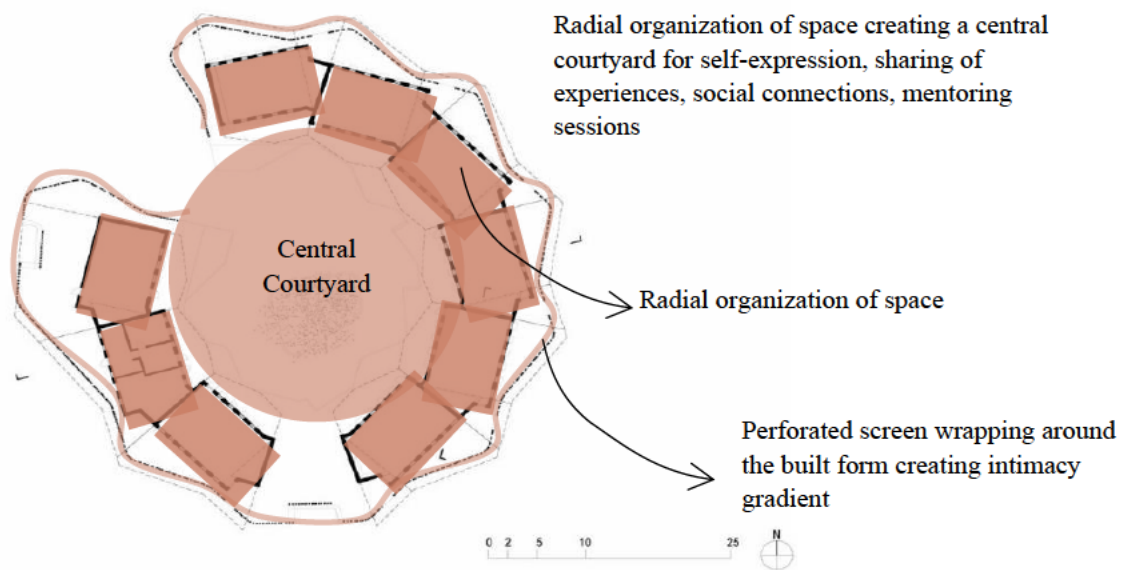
vi: The ground floor plan arrangement of spaces and form of spaces. (Source: www.kere-architecture.com)
